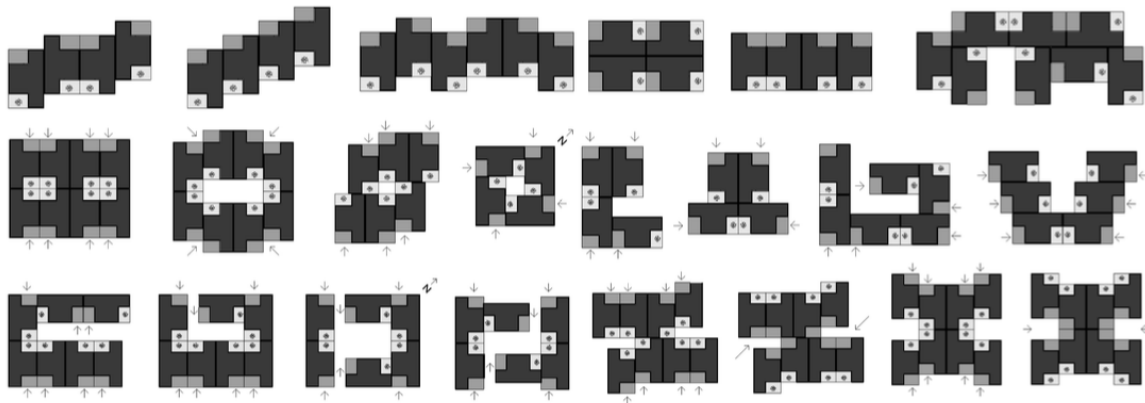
Architectural idea and examples of arrangements of T-houses . Houses can be connected by internal walls in a traditional row system and in a double row system, where they are connected by an internal wall and through external walls. It shows also the possibility of parallel connection in one line, moving by the depth of the terrace (11 degrees – one house and 20 degrees – 2 houses). It is also possible to combine both systems.
